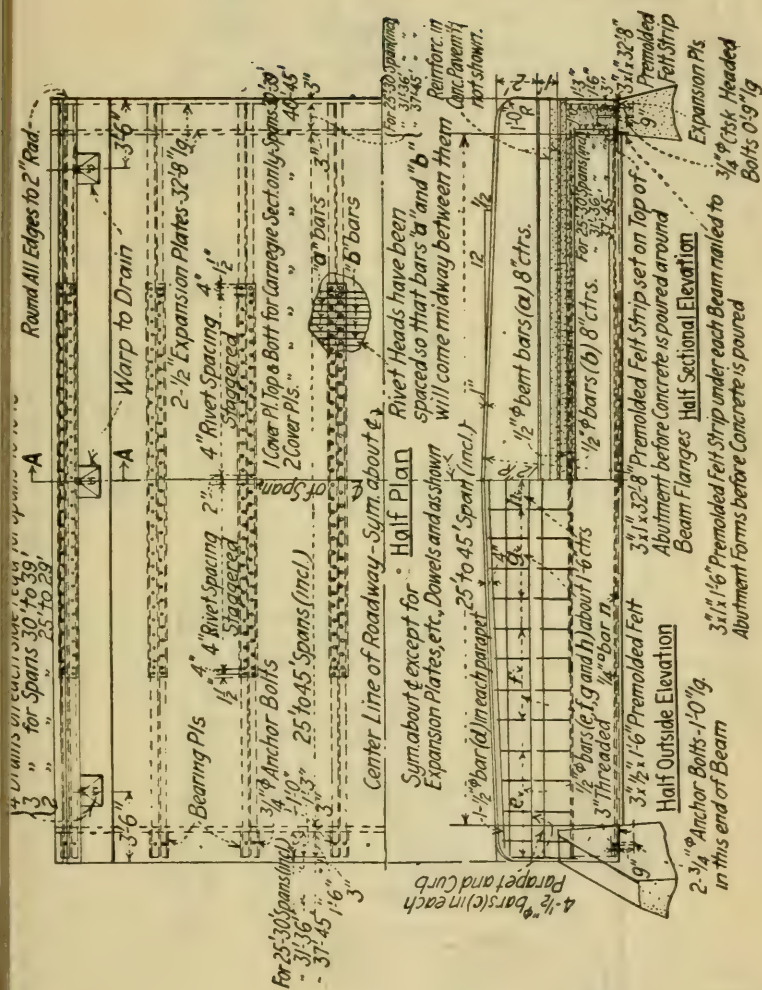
Steel I beam superstructures (H-20 loading). Spans 25 to 45 feet. New York State Standards 1926. (Dimensions pages 278–283.)
